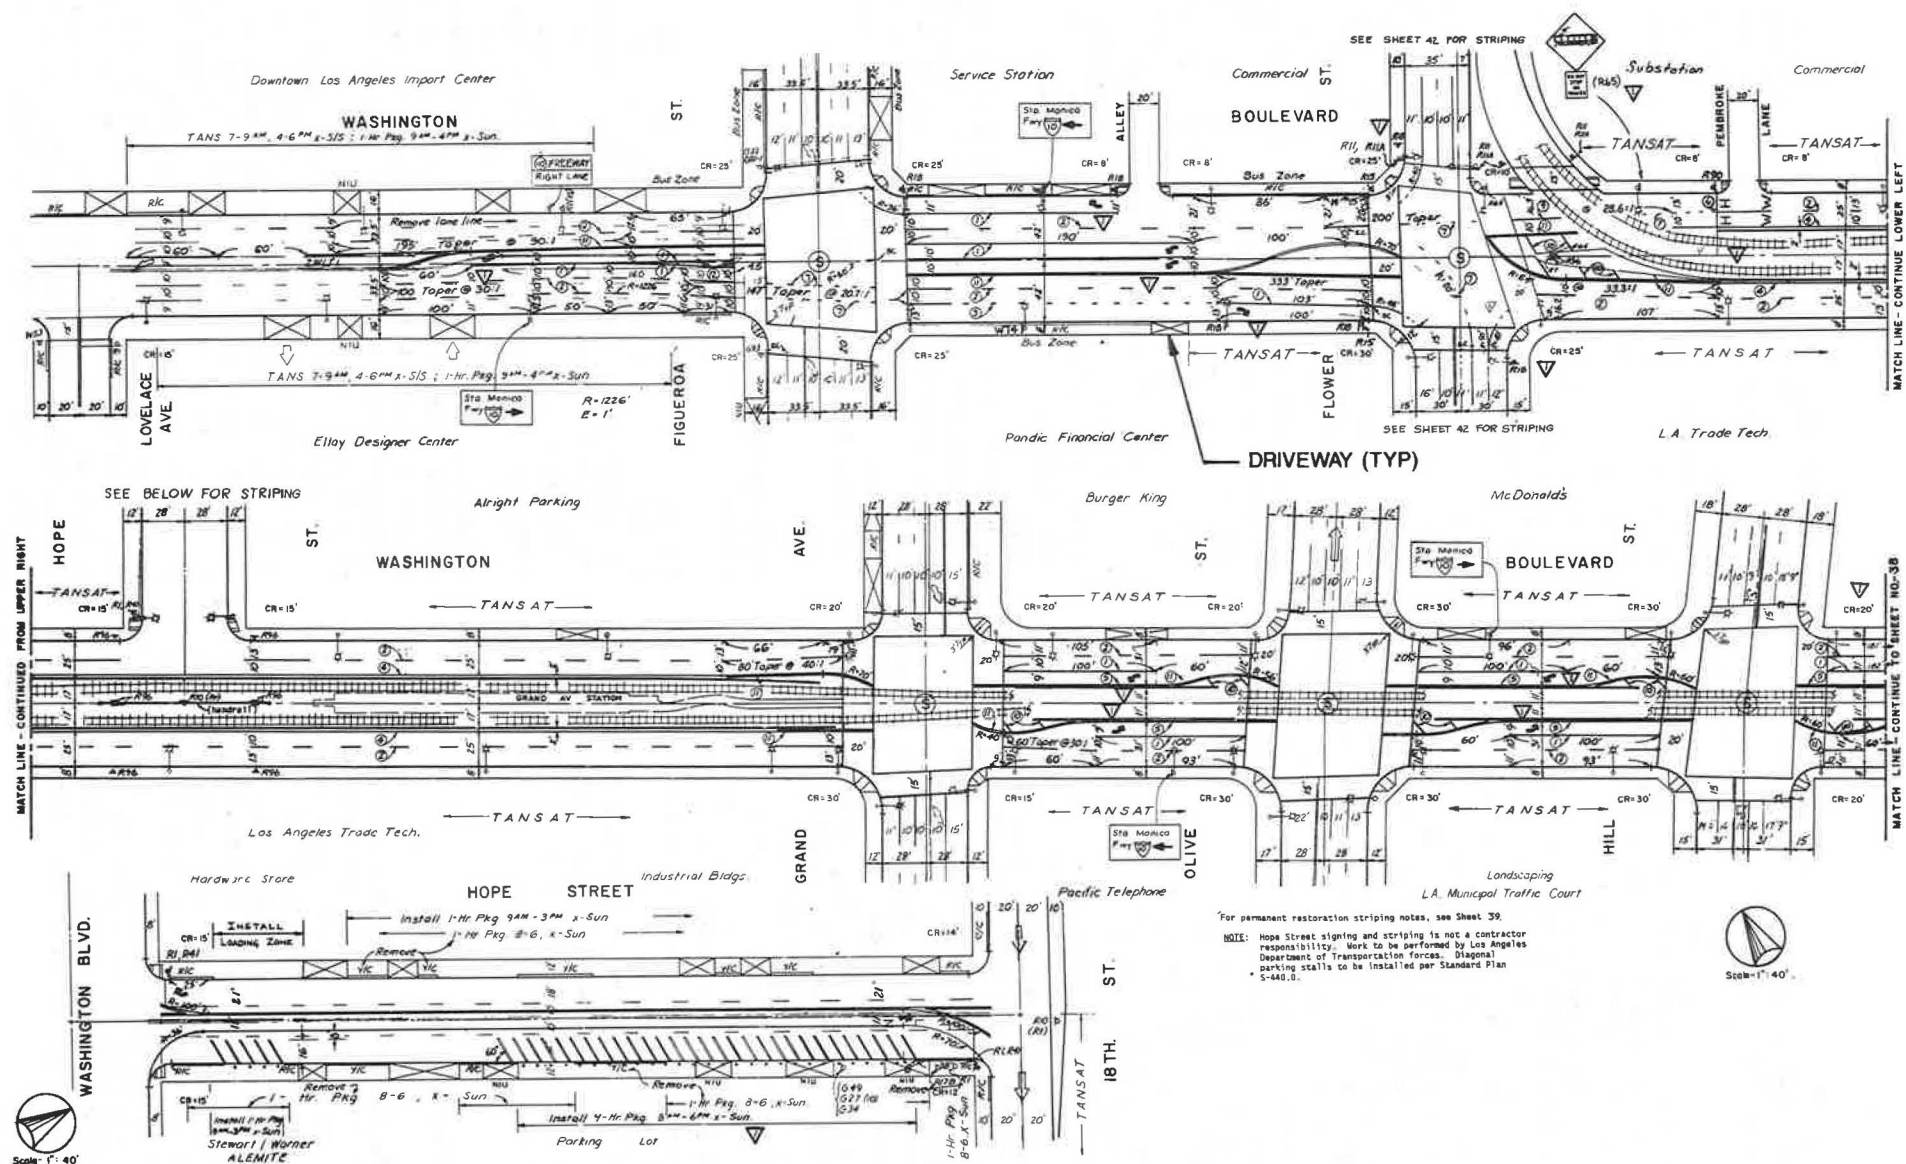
Roadway lane layout and trackway on the short blocks typical of the western portion of Washington Boulevard.
